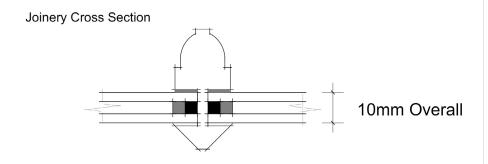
Typical section detail showing an ultra-slimline double glazed unit mounted with putty in a replica glazing bar. The glazing bar profile is very similar to historic examples.
